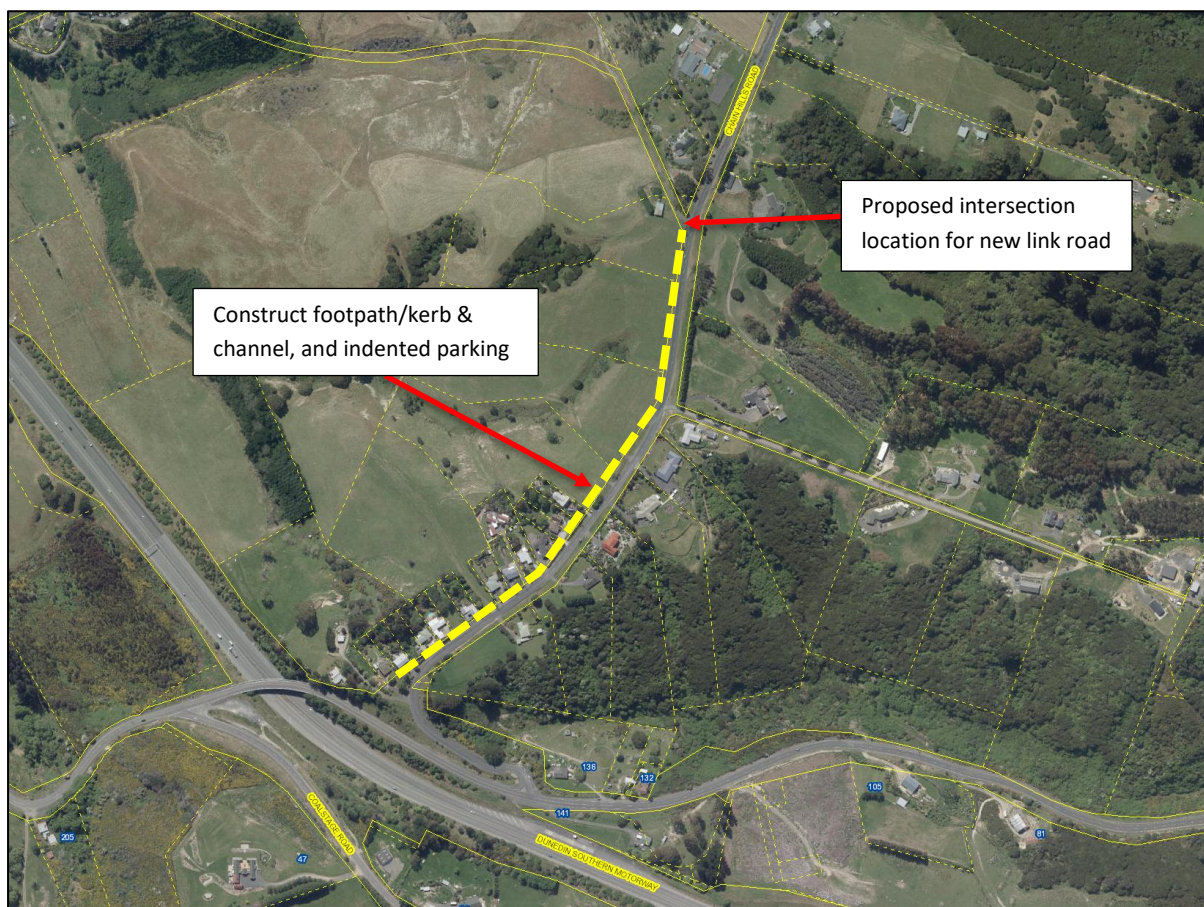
General scope of proposed footpath to be installed on Chain Hills Road for pedestrians, adjacent to and opposite the development site.
